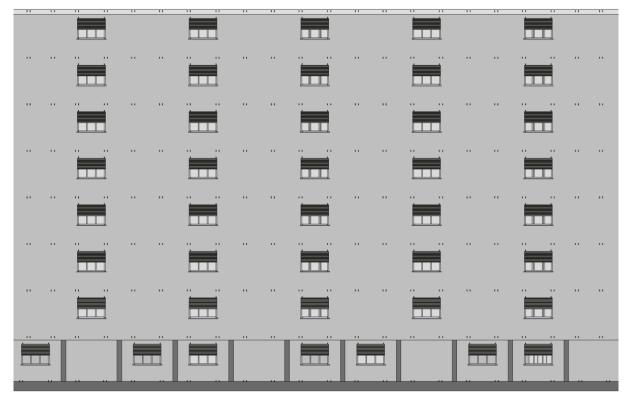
Revit Anchors Export - North Facade (Portion)
